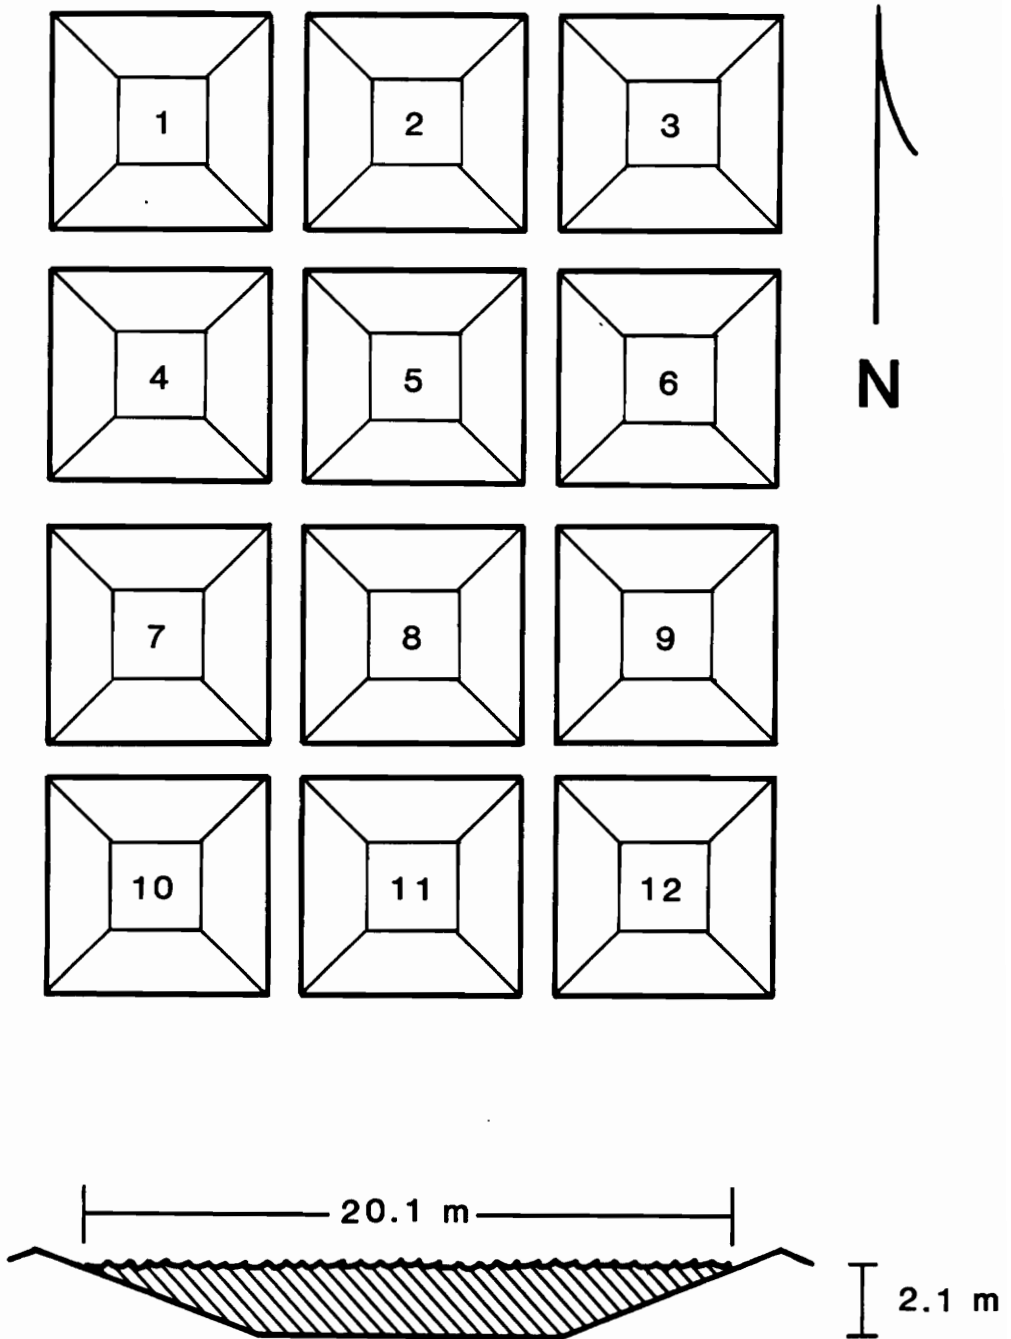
Experimental Pond Facility. The reservoir was located west of Ponds 1, 4, and 7. Slopes were 2.5:1.
